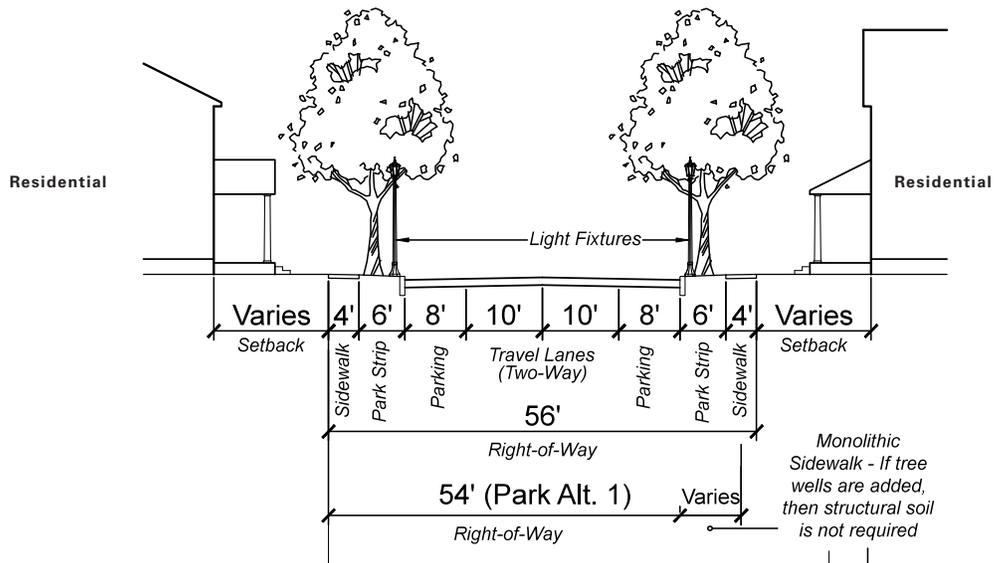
Proposed Section and Plan: Neighborhood Street A
